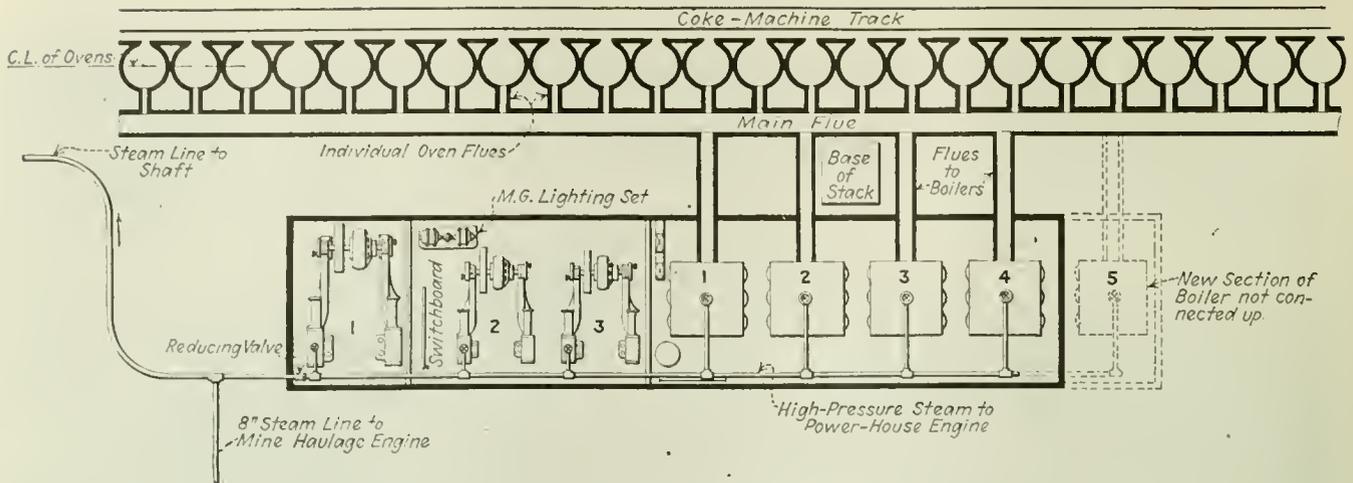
GENERAL PLAN OF ENTIRE WASTE HEAT PLANT
